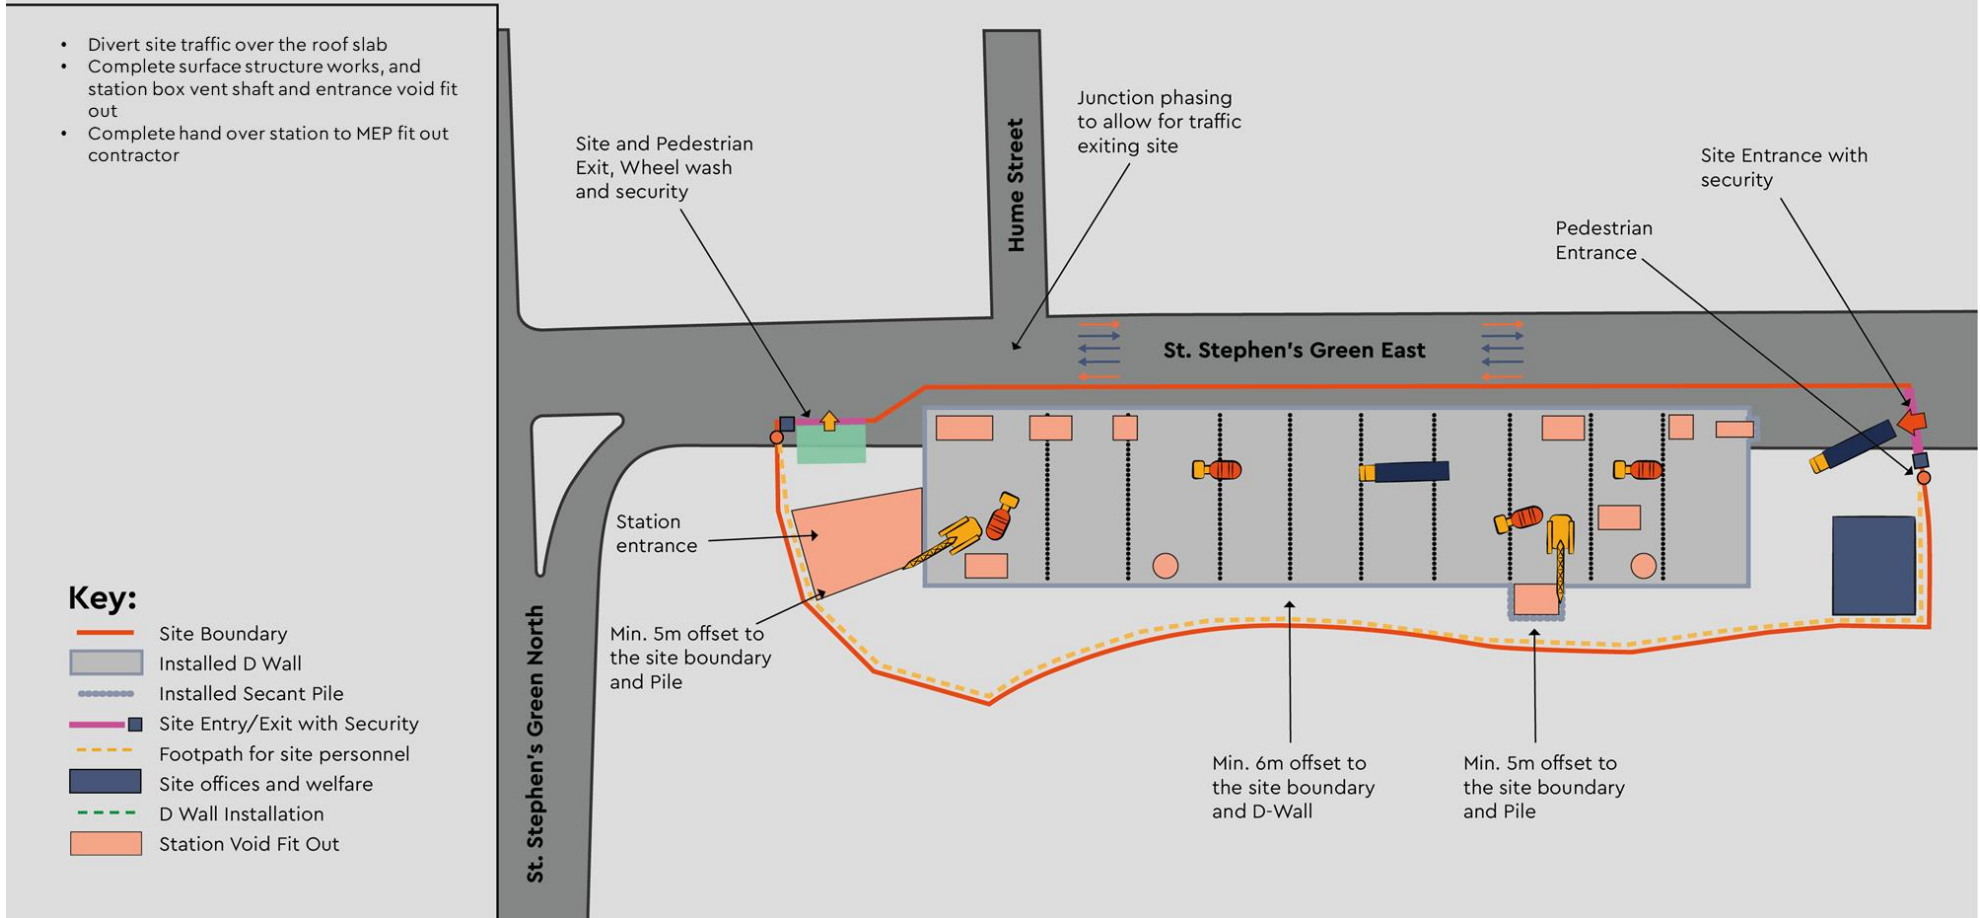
St Stephen's Green Stage 5 – Station fit-out
